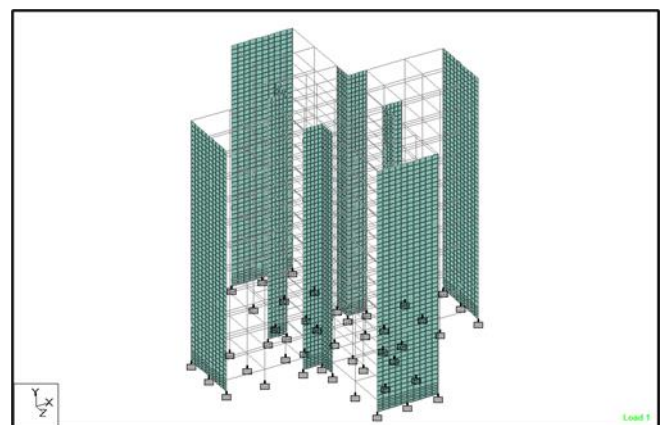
3D model of the structure with shear wall at edges and re-entrant corners (Model 3)
